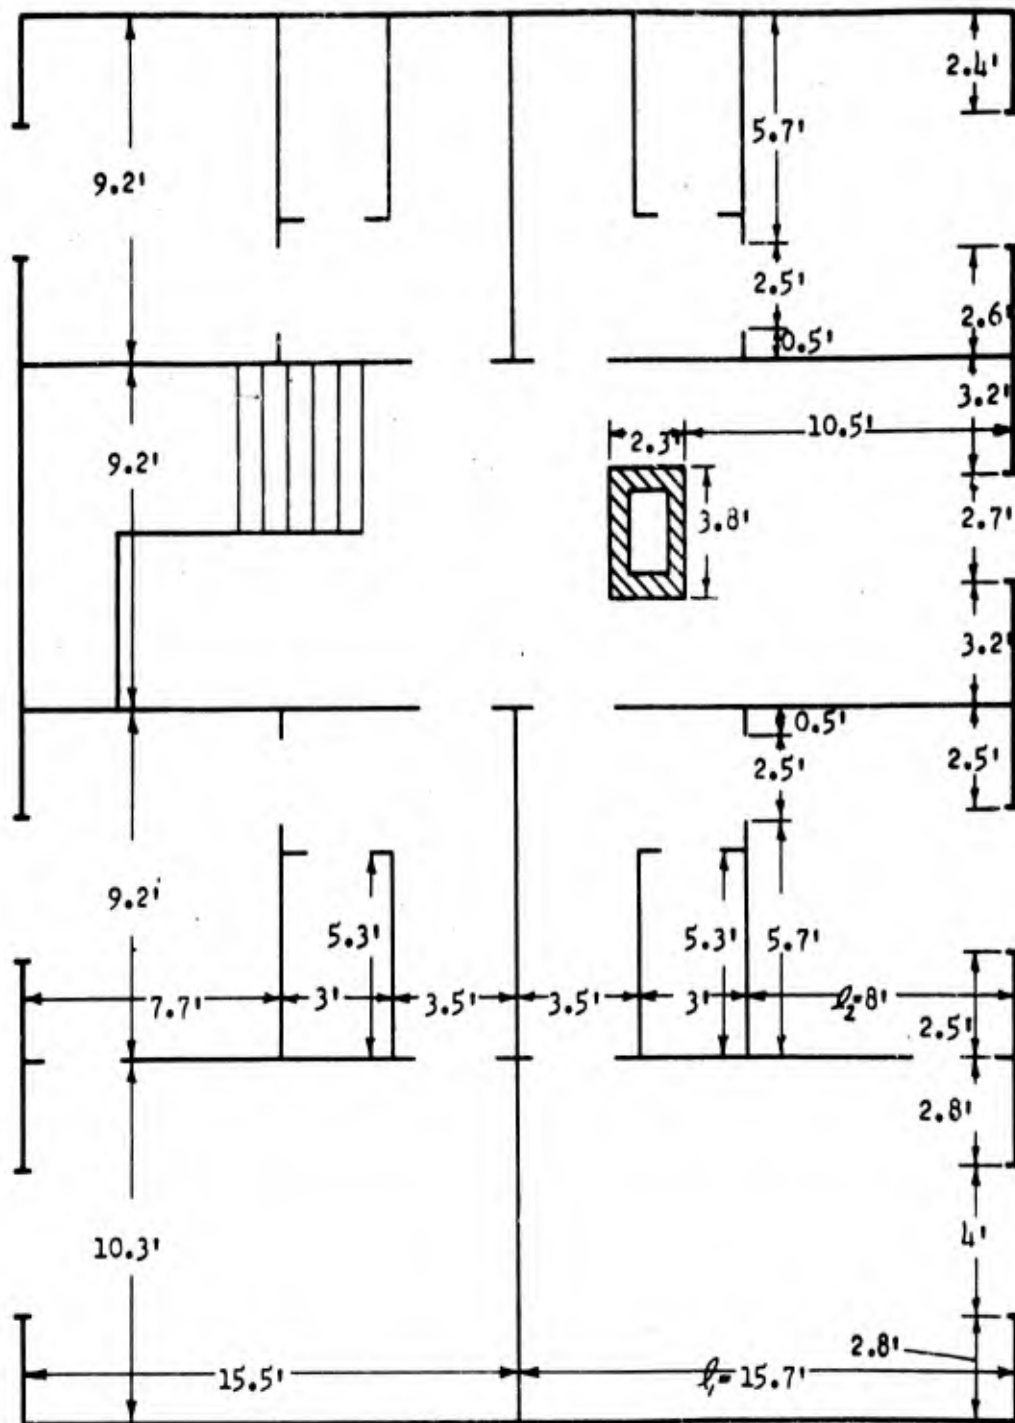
First Floor Plan Dimensions of 3.3.5 Type Buildings
